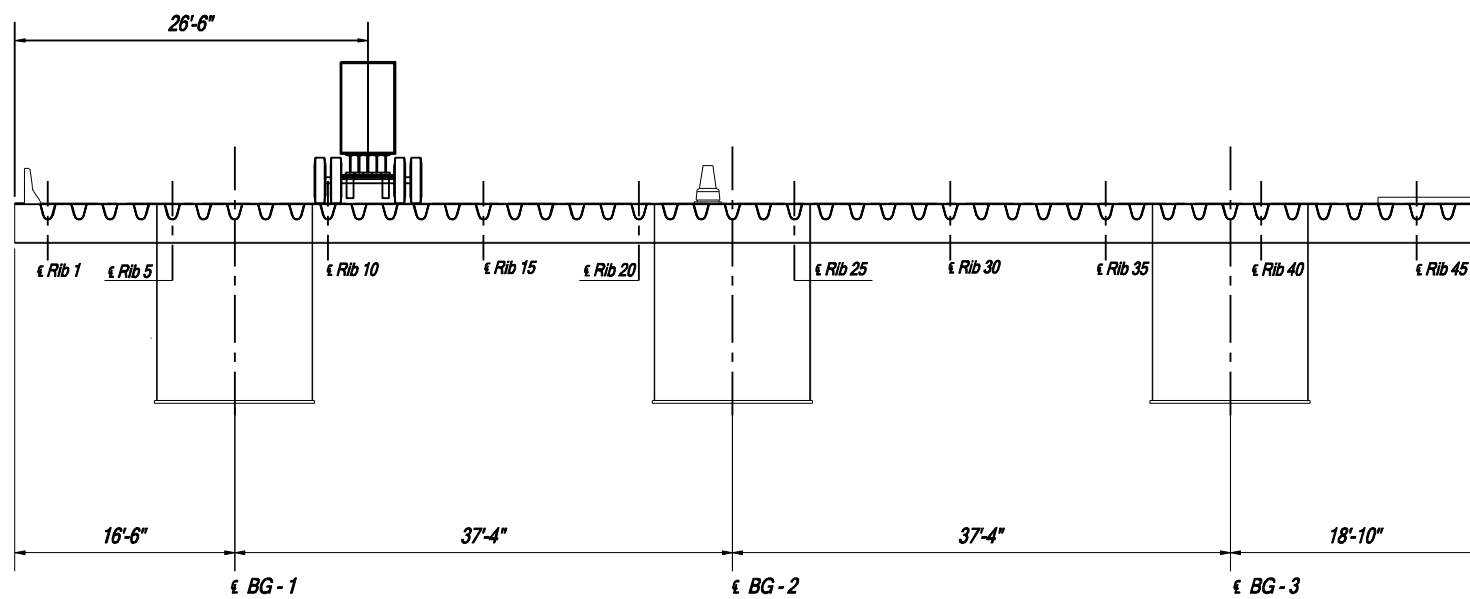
Transverse load position T27 considered for FEA of bridge deck
